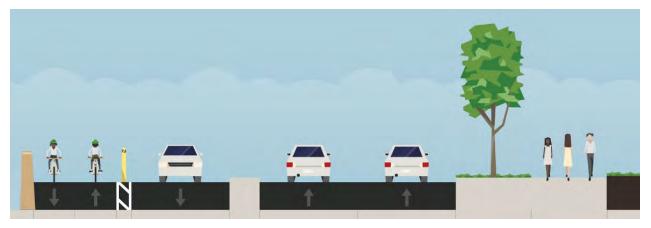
Proposed conditions on 12th Street between St. Peter Street and John Ireland Blvd (looking west).
